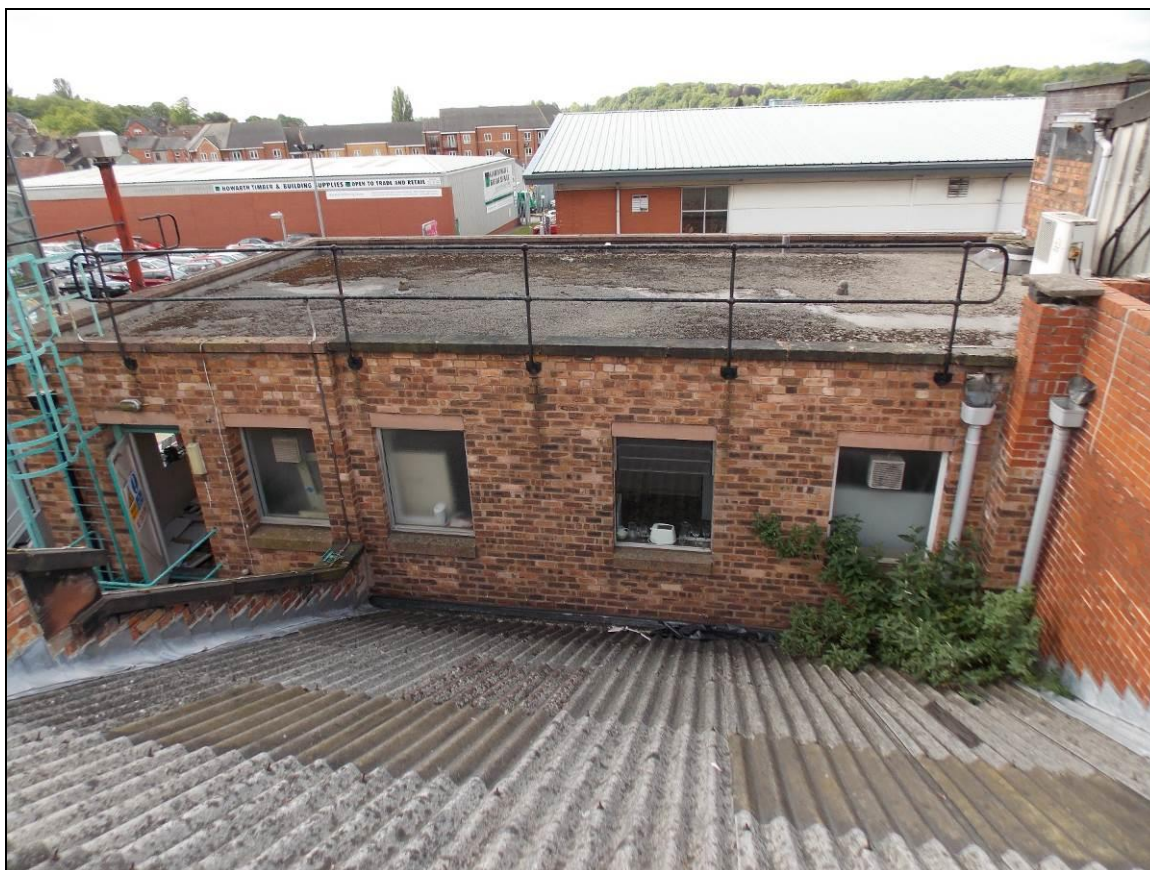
First floor of the north elevation of the Boiler House, looking south.
